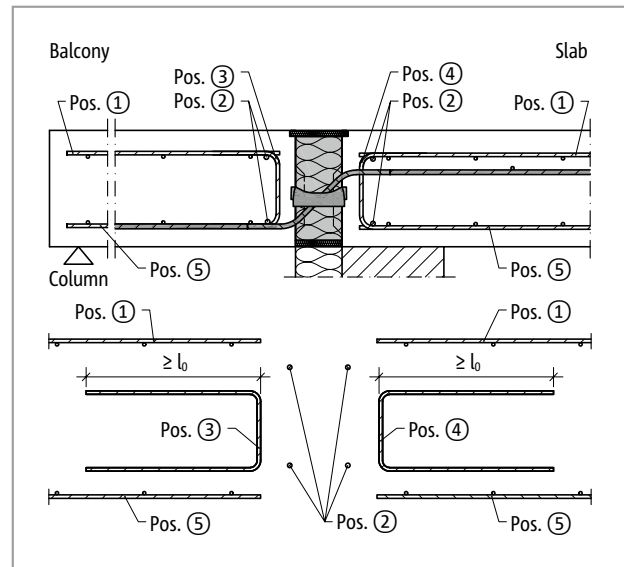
Schöck Isokorb® T type Q-V6 up to Q-V10: On-site reinforcement
